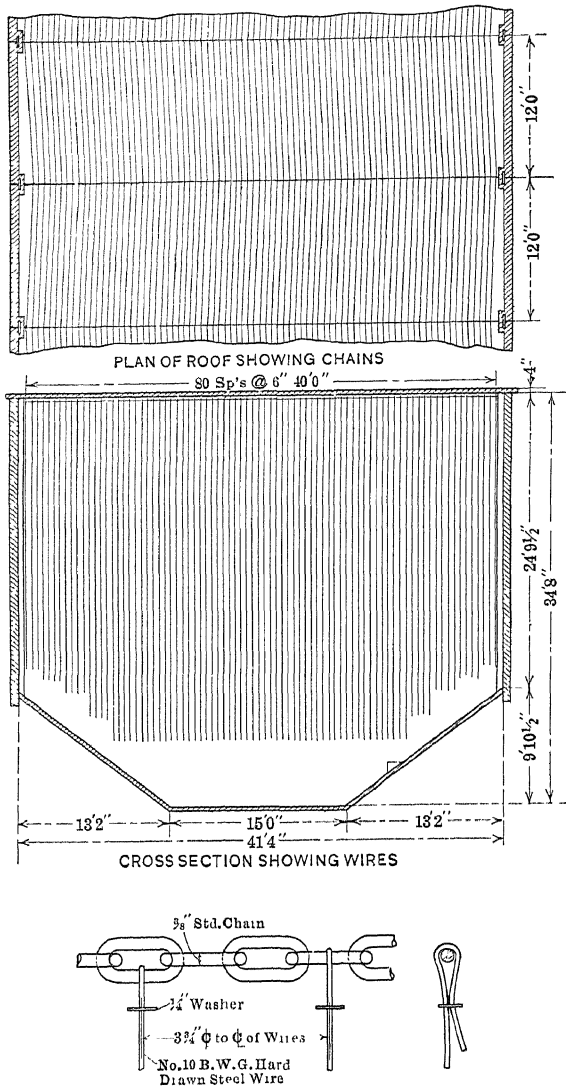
ARRANGEMENT OF BAFFLING WIRES FOR DUST CHAMBERS. DETAIL SHOWING METHOD OF ATTACHING WIRES TO CHAINS.
